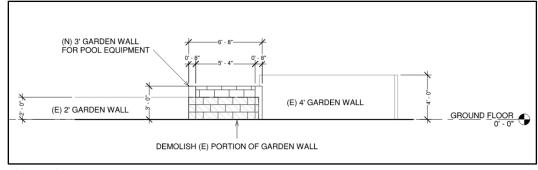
Elevation of portion of retaining wall to be reconstructed
